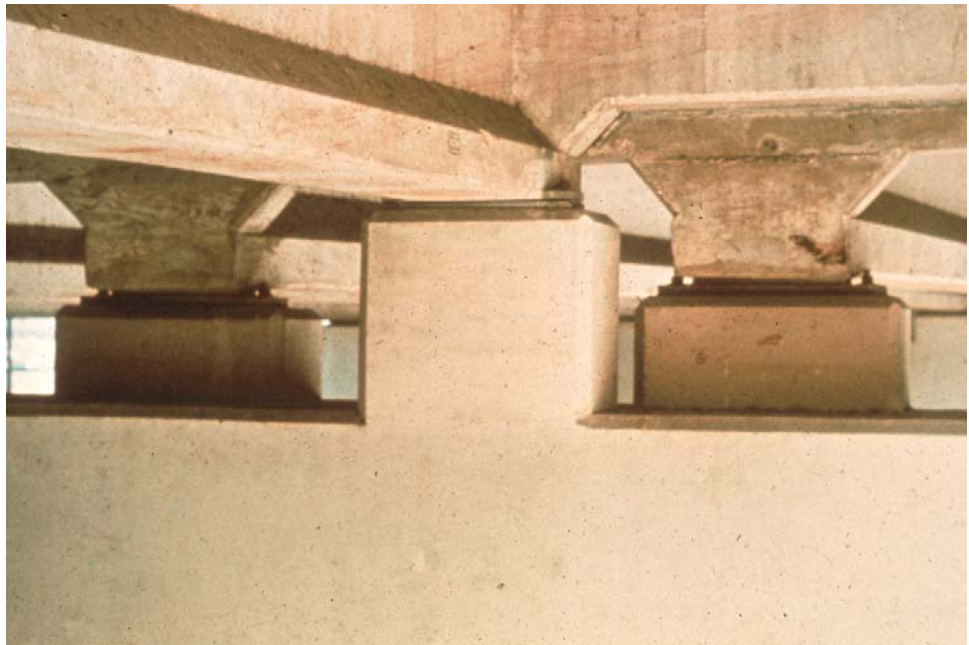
Bearing Area of a Typical Prestressed I-beam
